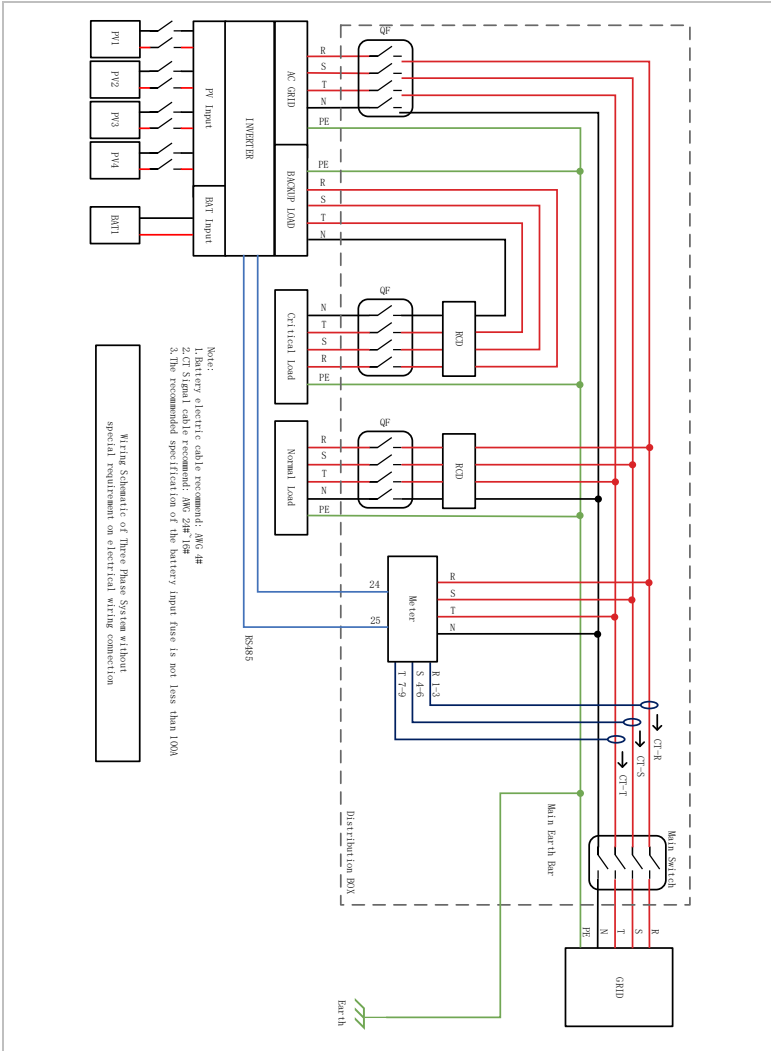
Electrical connections (Plan B: Meter + CTs)
